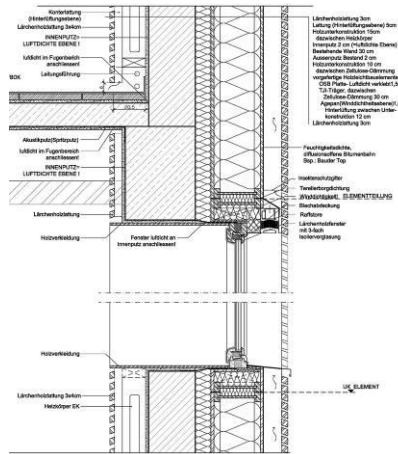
DETAIL WITH PREFABRICATED WOODEN ELEMENTS
